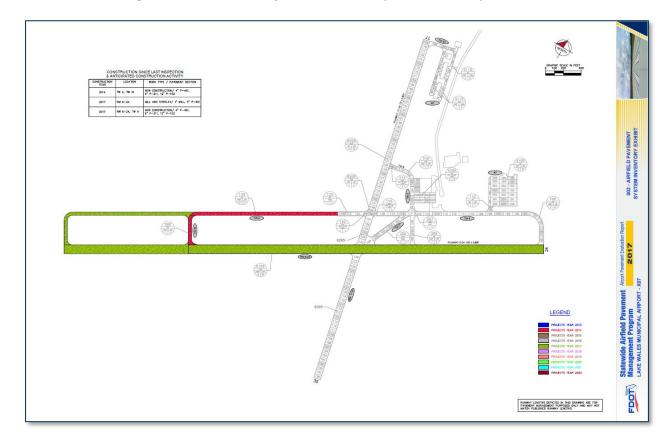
2017 Airfield Pavement Network Definition Exhibit
